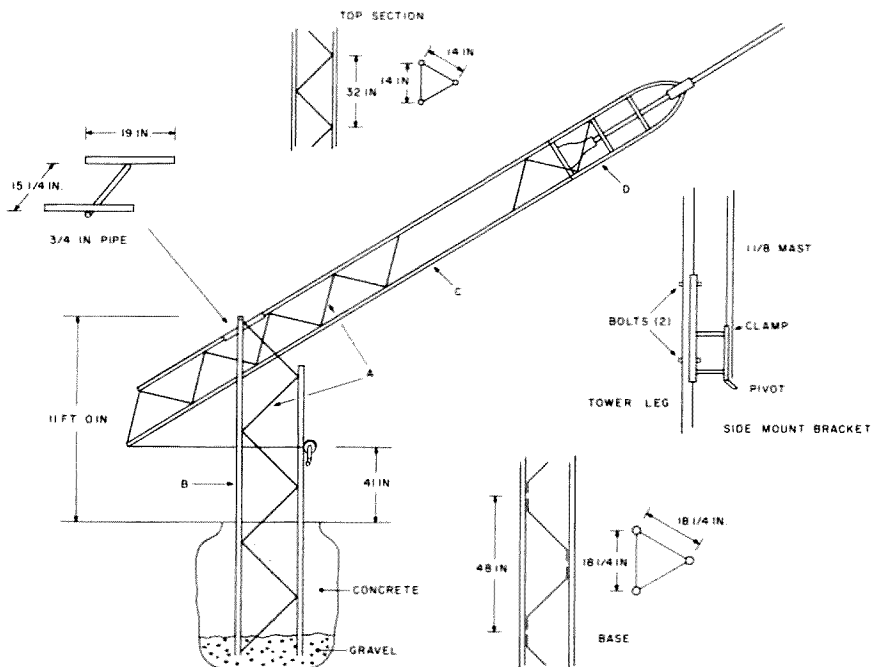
A = 3/8" rebar. B = 1/4" galvanized pipe. C = 1/2" galvanized pipe. D = 3/4" conduit tubing.
